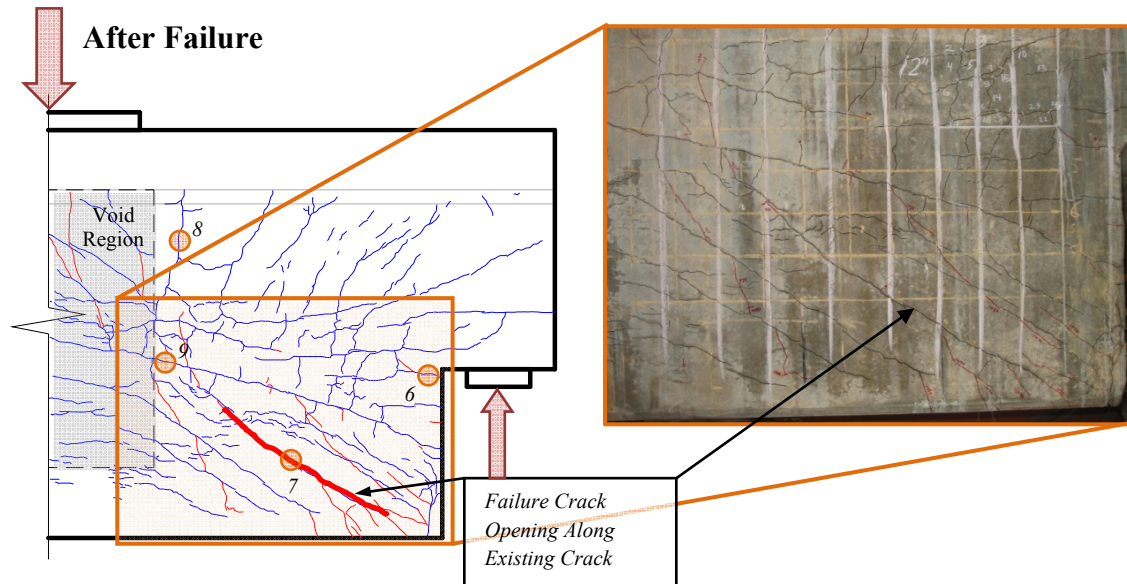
Cracking on the east side of beam RF-3R-9(a) after failure.
